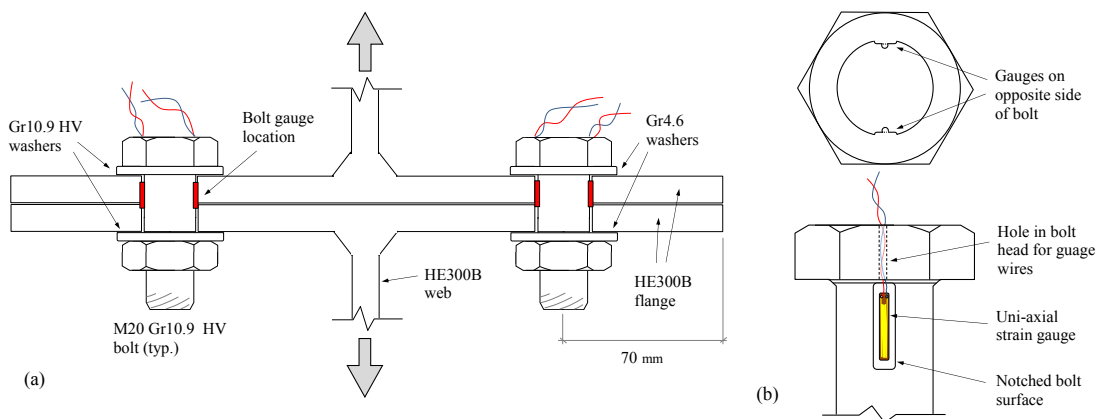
(a) Specimen TS1 geometry and bolt locations (b) bolt instrumentation (all T-stub specimens)
